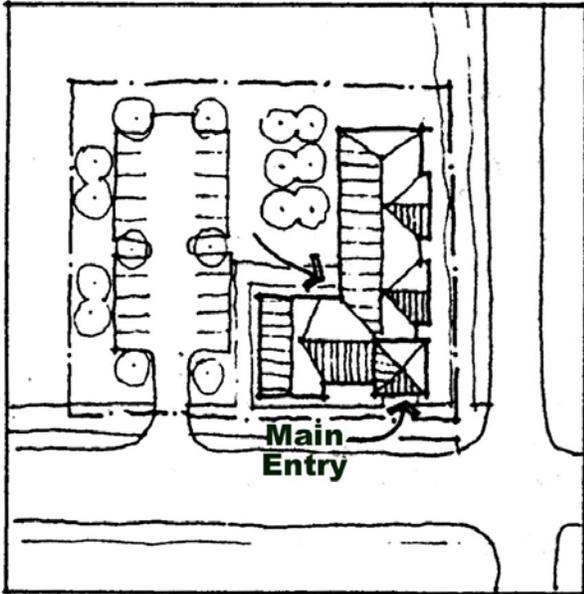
All buildings should be sited and have building elements, like entries, that relate to the street. Entries to buildings should not just be from parking lots.
